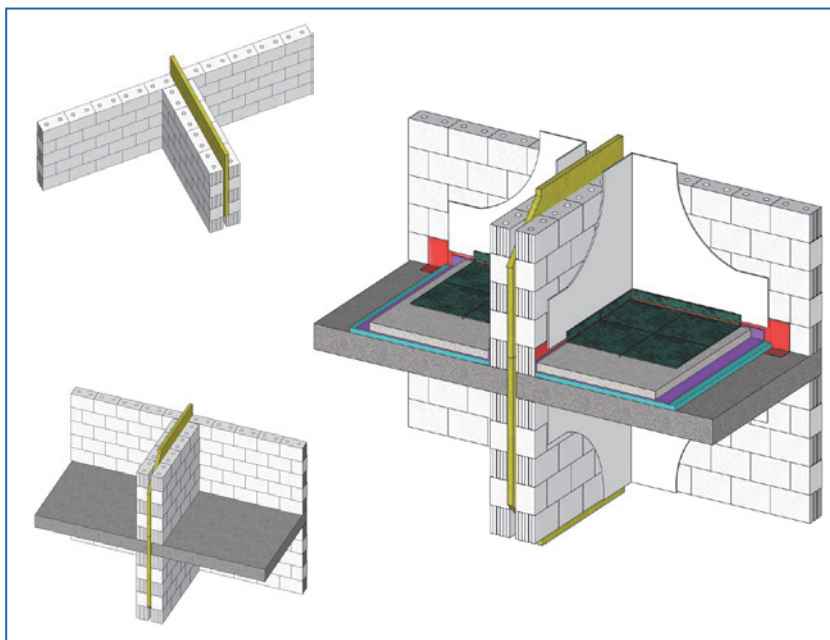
Drawing of building concept 1 using heavy walls ($>250 \text{ kg/m}^2$).
